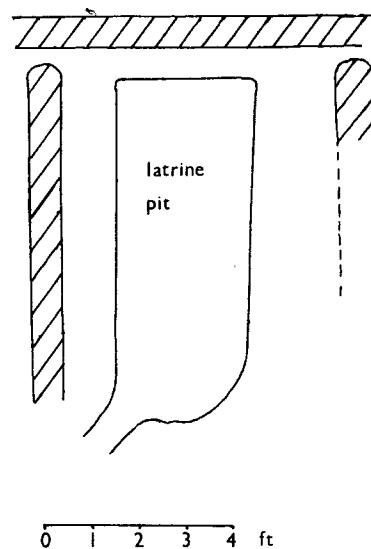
Plan of latrine pit in Tribune's House No. III. Scale, 1: 48
